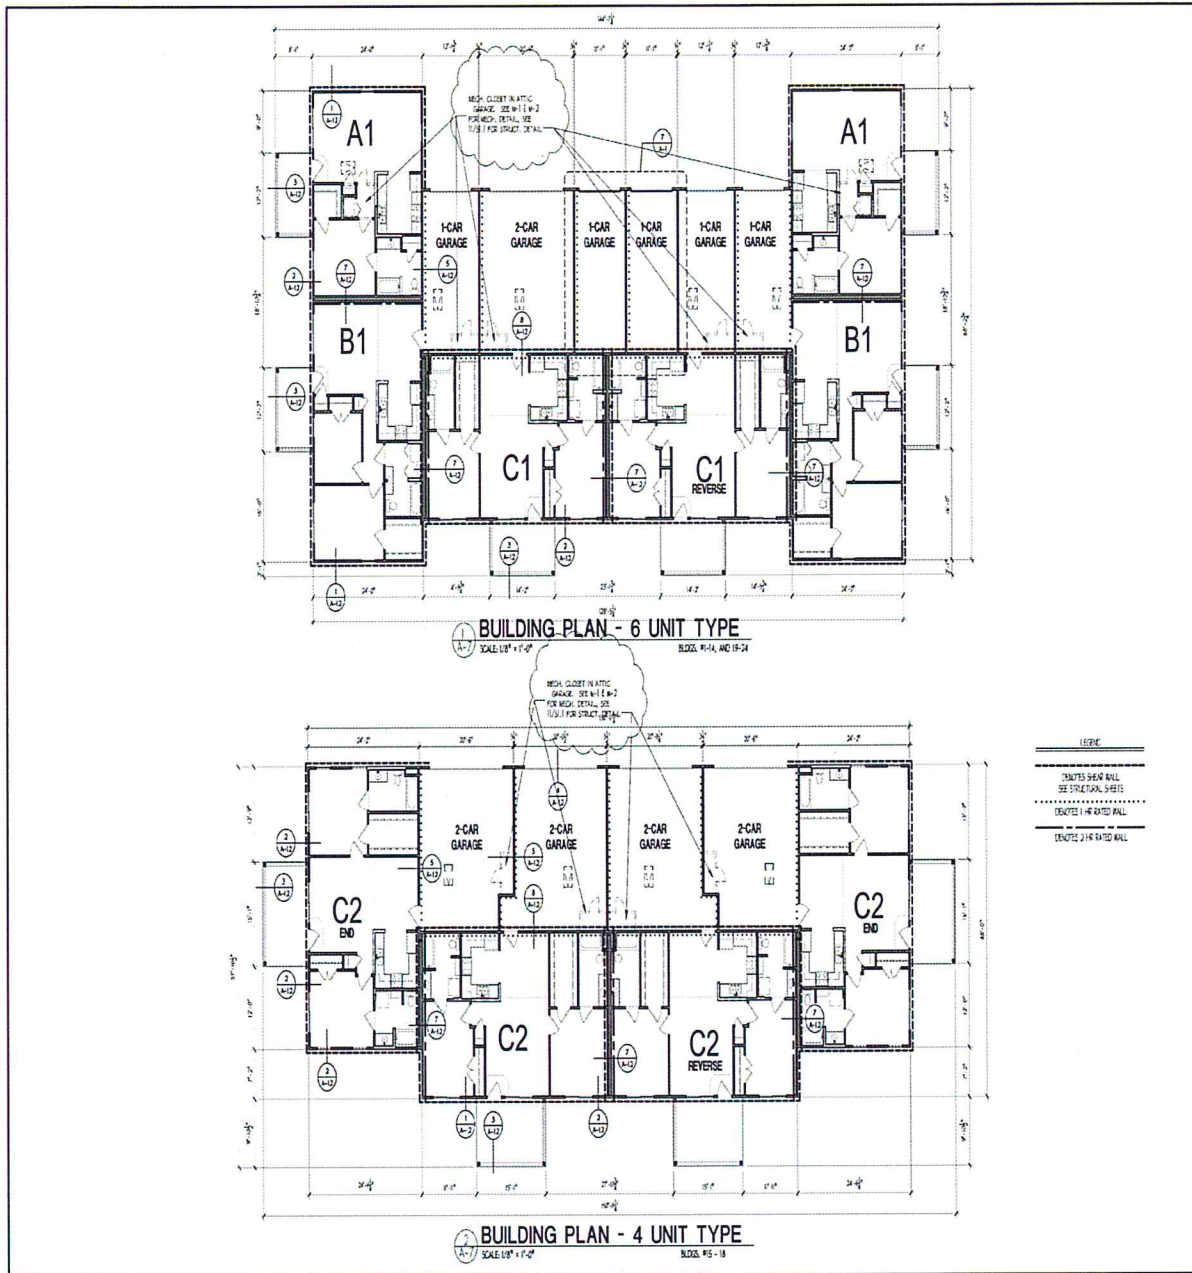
EXHIBIT B: PROPOSED SITE PLAN CONT'D
